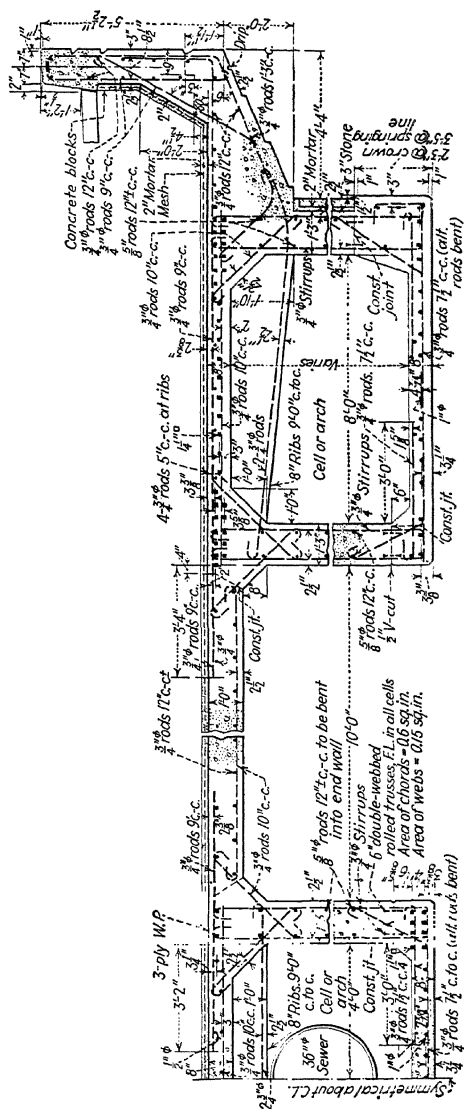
Section of Summit Avenue Bridge, New Jersey approach to the Lincoln Tunnel in Union City, N.J.
